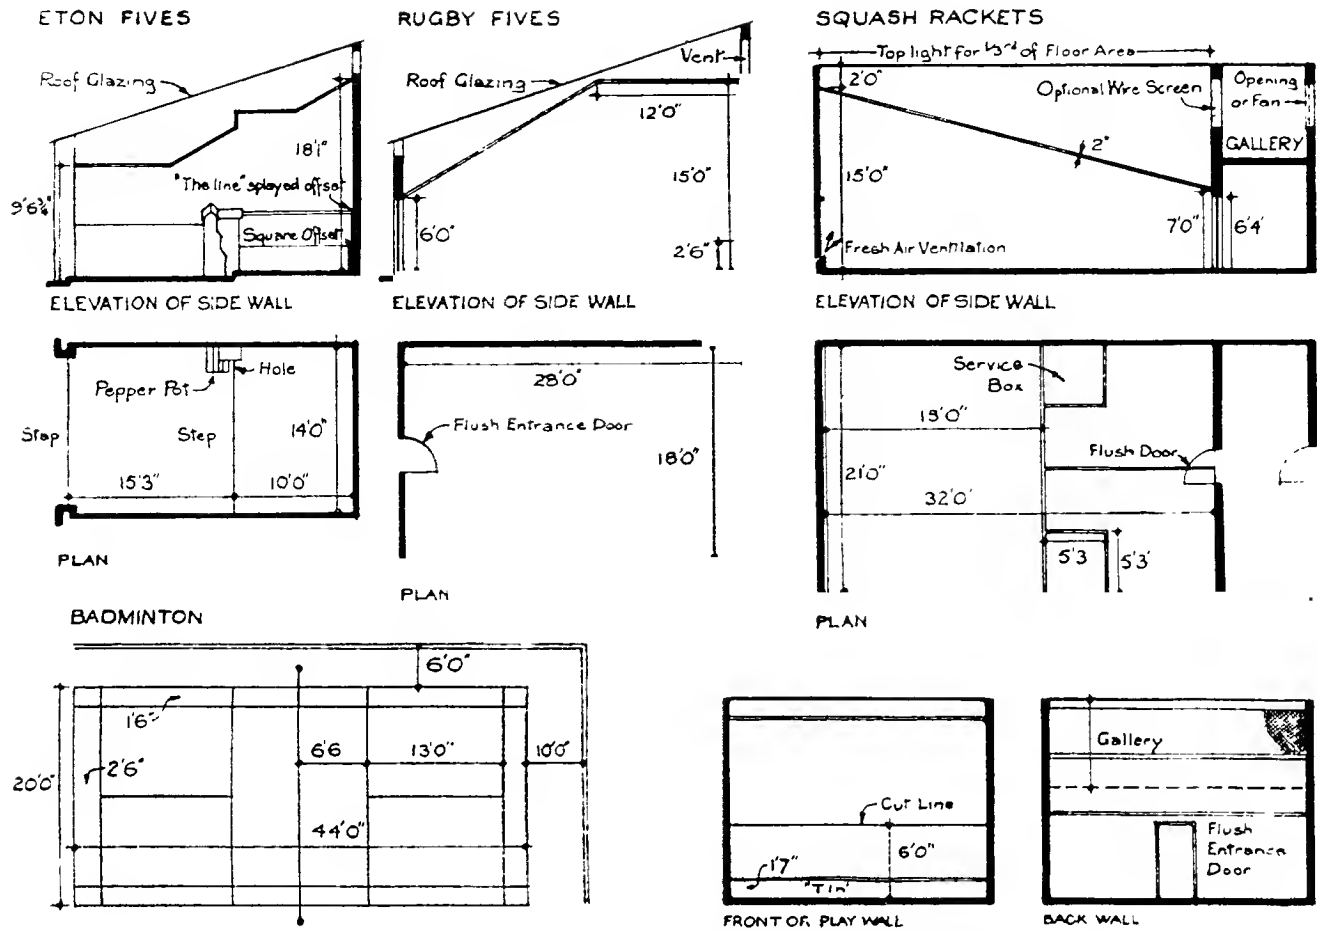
Layout and dimensions of courts for fives, squash rackets and badminton
